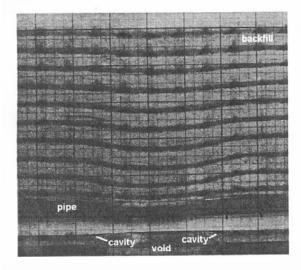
Failure pattern in longitudinal section of model 1 (flexible pipe in loose backfill)
